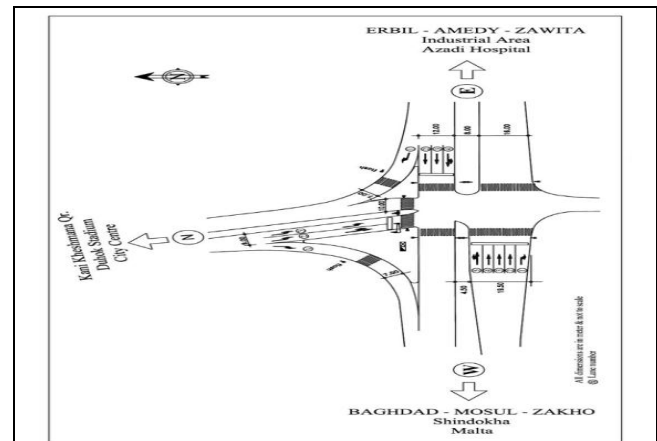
Raza Intersection (R) Plan (Directorate of Traffic, Traffic Engineering Department, Duhok City, 2009)
